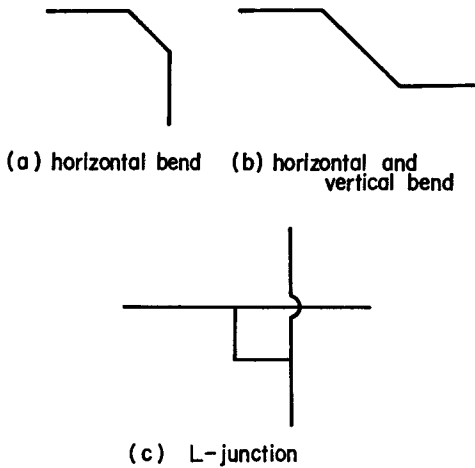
Typical Structural Forms at Bent and Crossing Sections.
